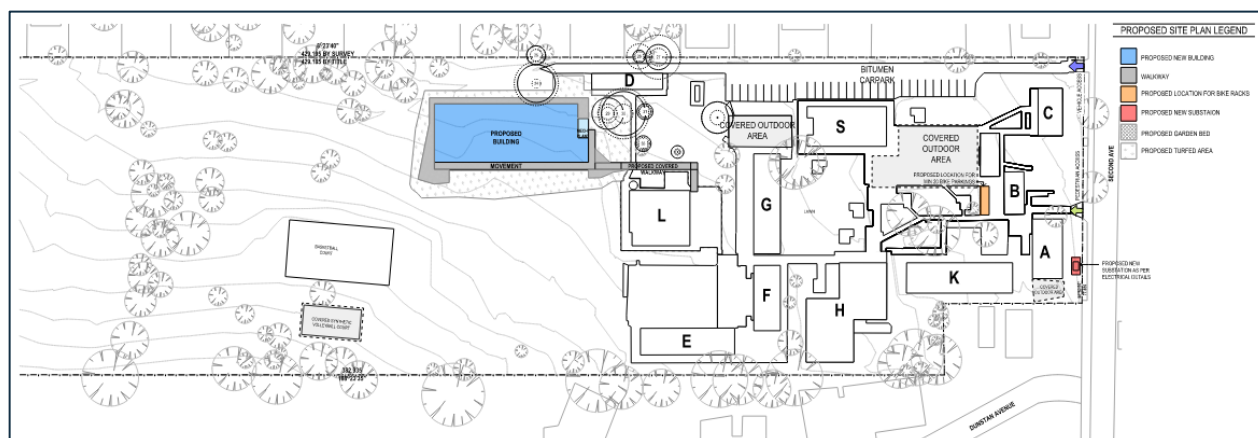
PROPOSED SITE PLAN REVISION 06
